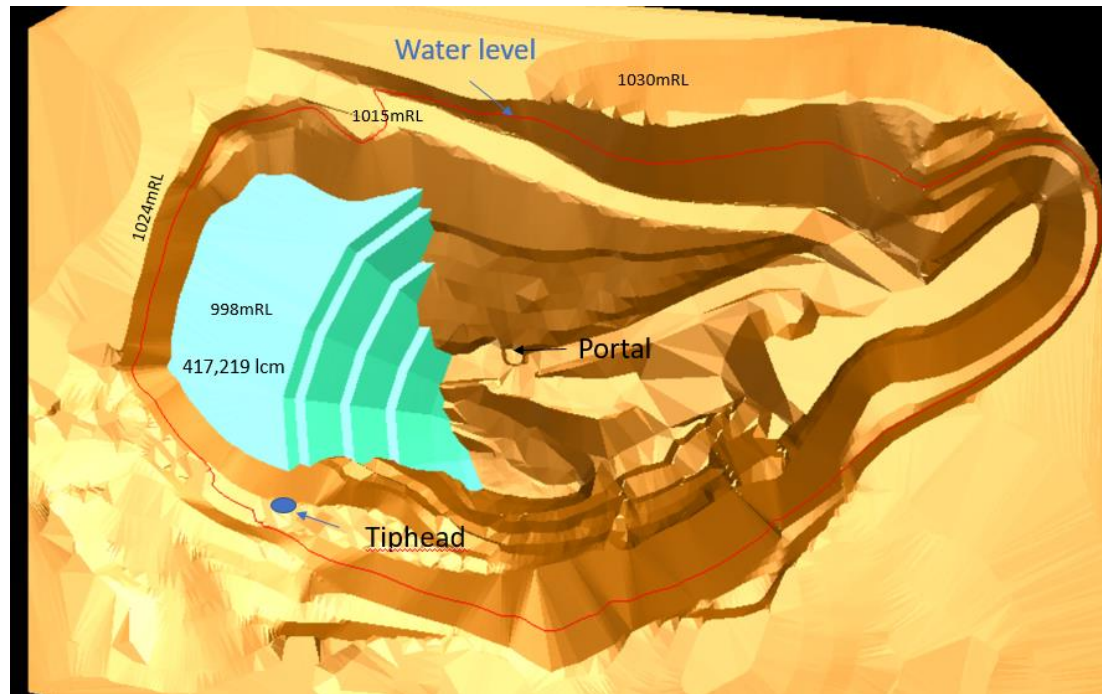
The Positioning of the Waste within the final in-pit Waste Storage Facility.
